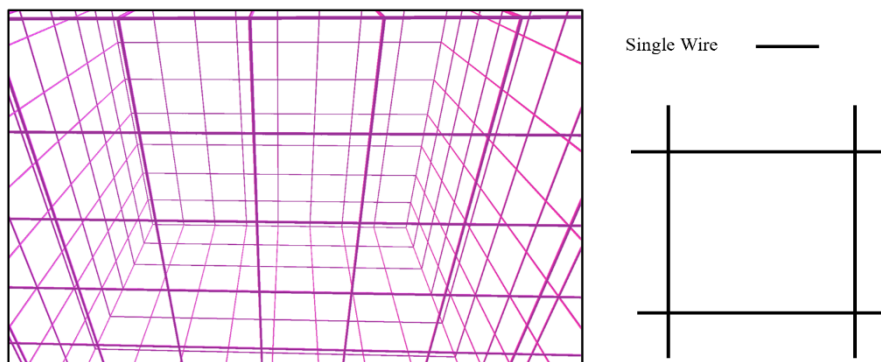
Welded wire pattern for gabion basket.
